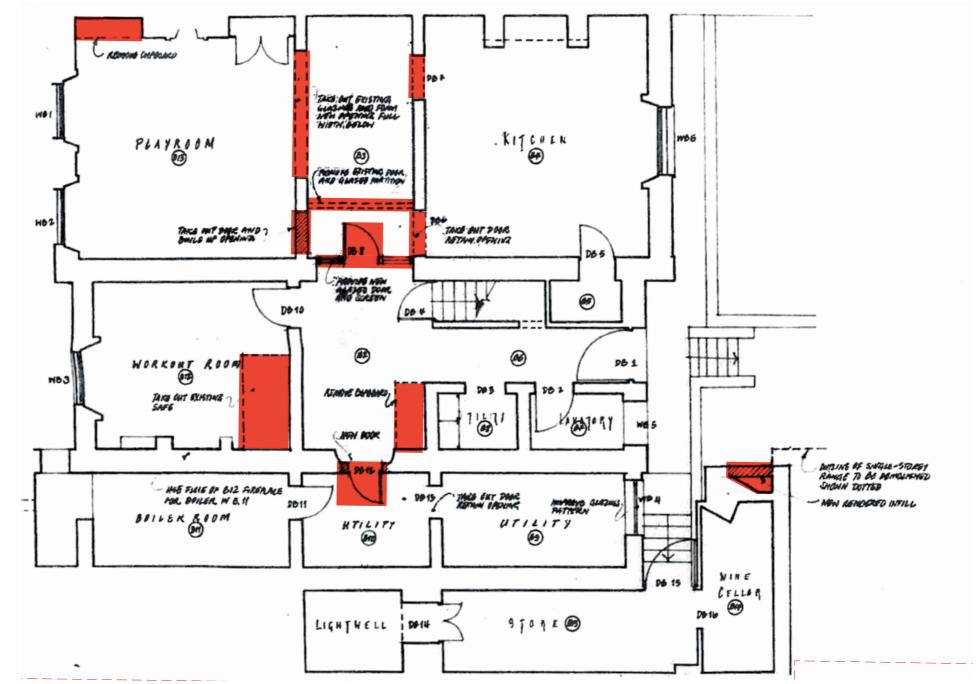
Lower ground floor plan of 1990s works proposed and implemented by Donald Insall Associates
